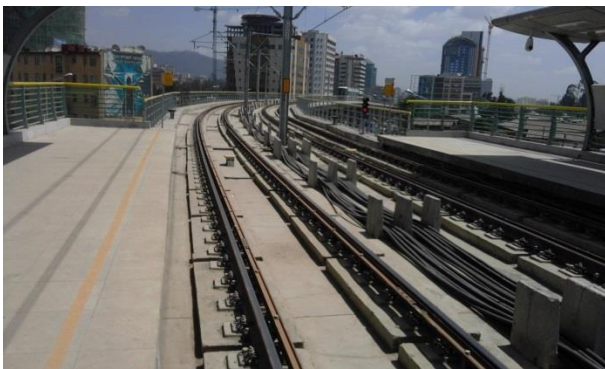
Slab track bridge Mexico Addis Ababa, Ethiopia
